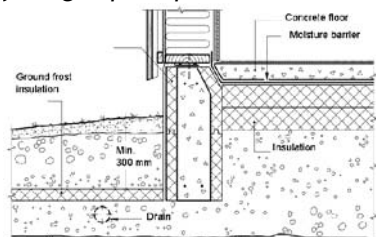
Detail avoiding thermal bridge and air leakage at the wall/slab-on-ground junction [© SINTEF]
